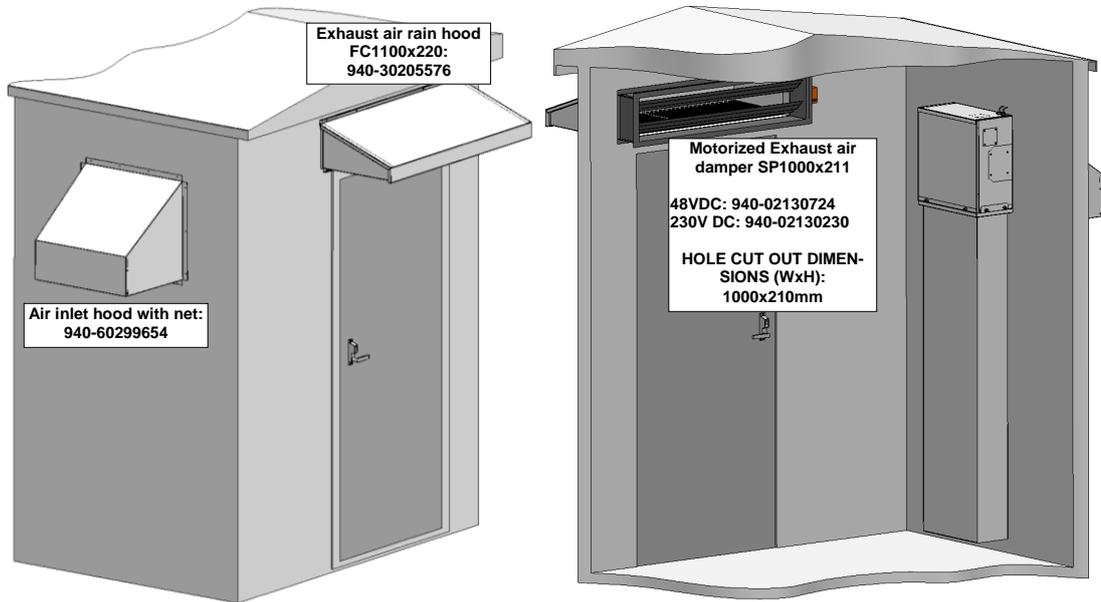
Illustration DFC 450 The drawings below illustrate the dimensions of the DFC 450.
